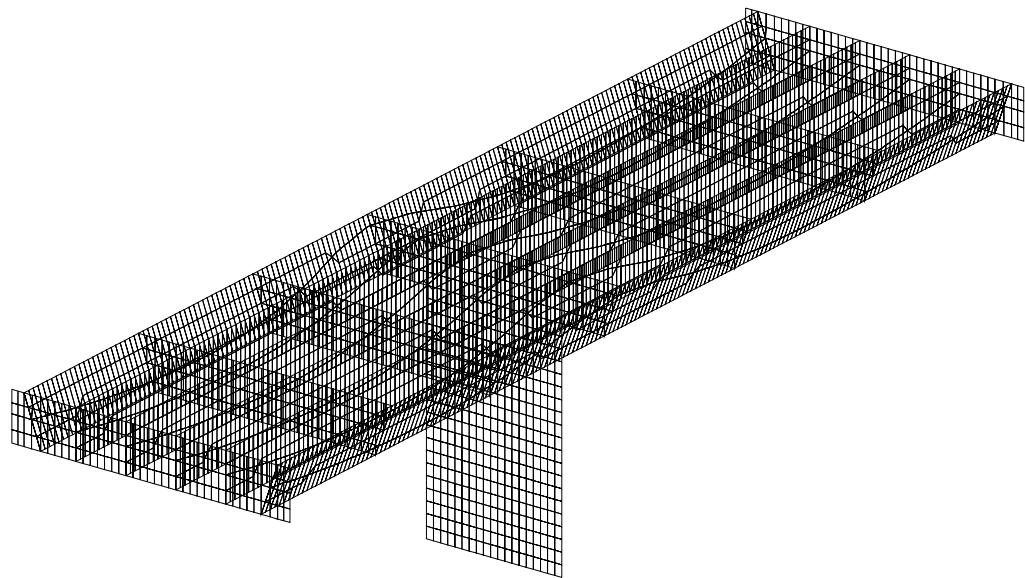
Bridge I871E Shown Without Bottom Sofit and Top Deck
